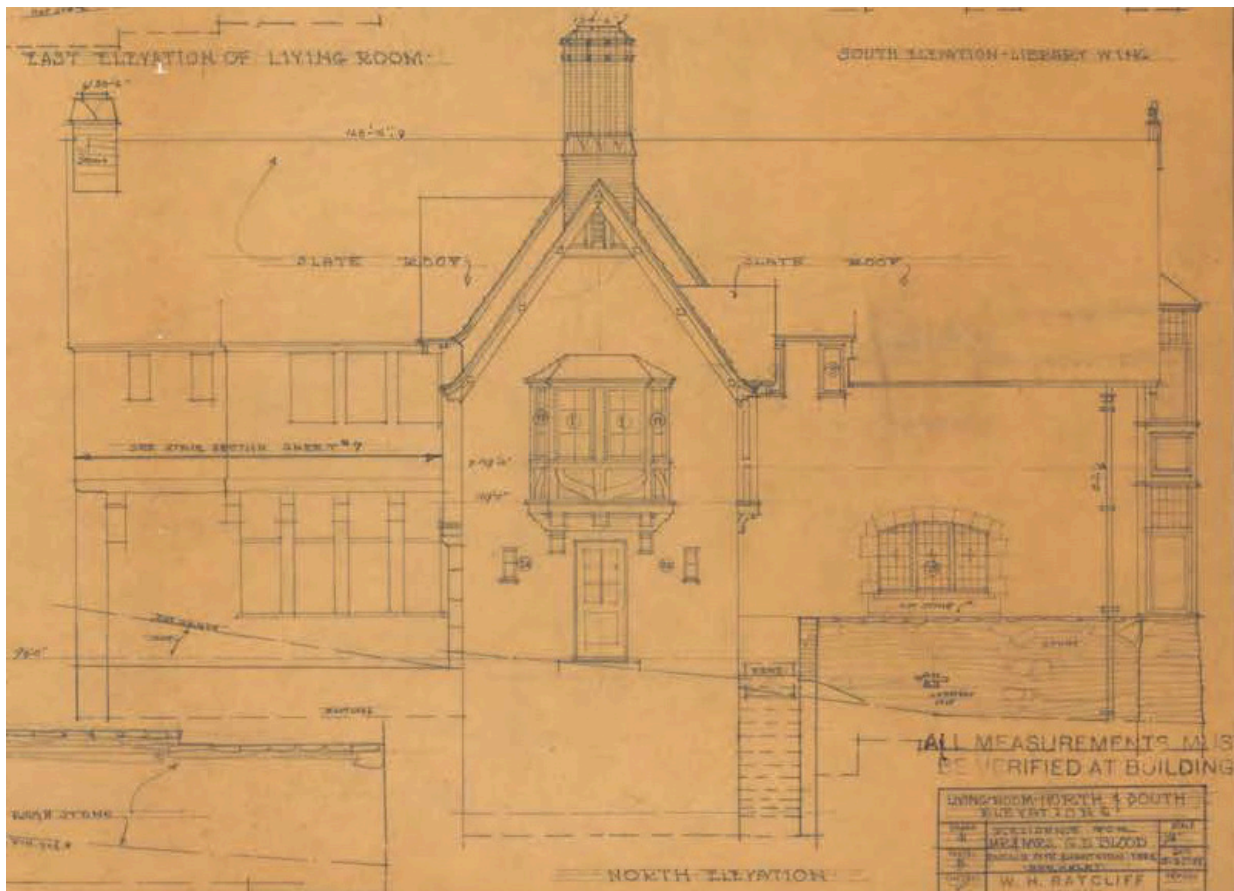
1929 North side elevation (courtesy The Bancroft Library)
